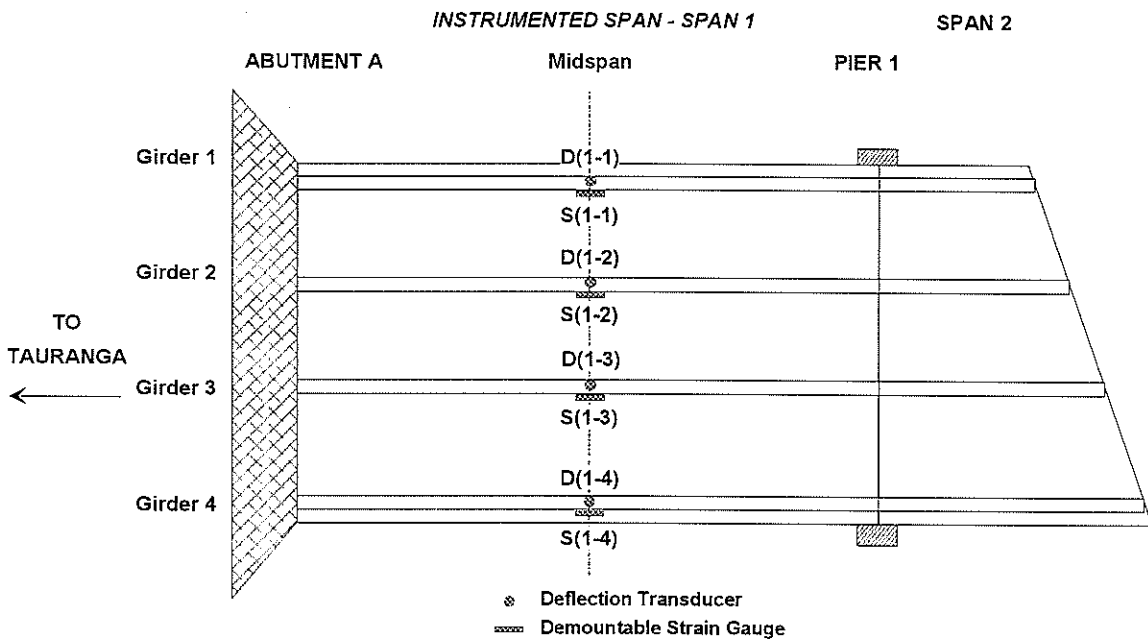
Instrumentation plan for Tuakopai Bridge.
